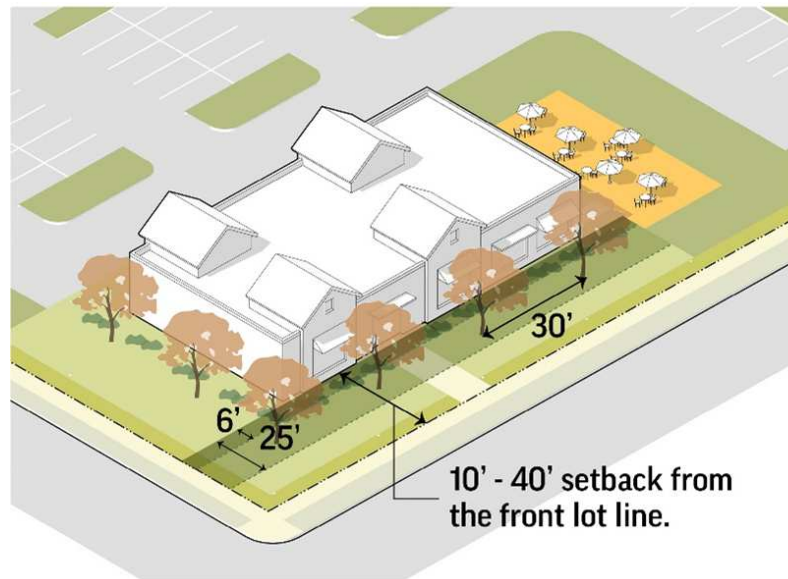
Foundation and frontage plantings provide a second layer of landscape to accent the building, particularly where buildings are setback more from the street.
